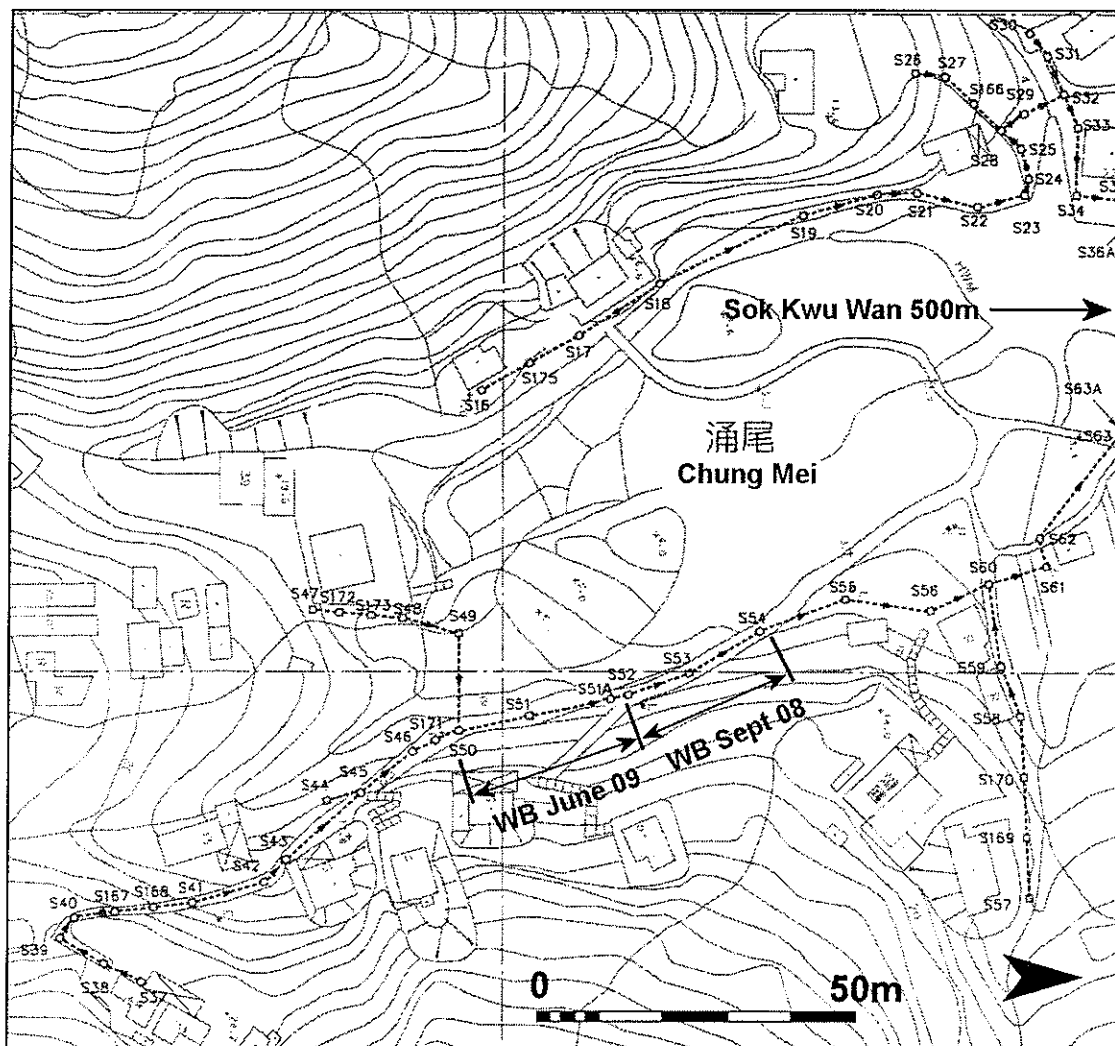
Plan showing location of sewer trench alignment at Chung Mei, with September 2008 and June 2009 watching brief areas highlighted
